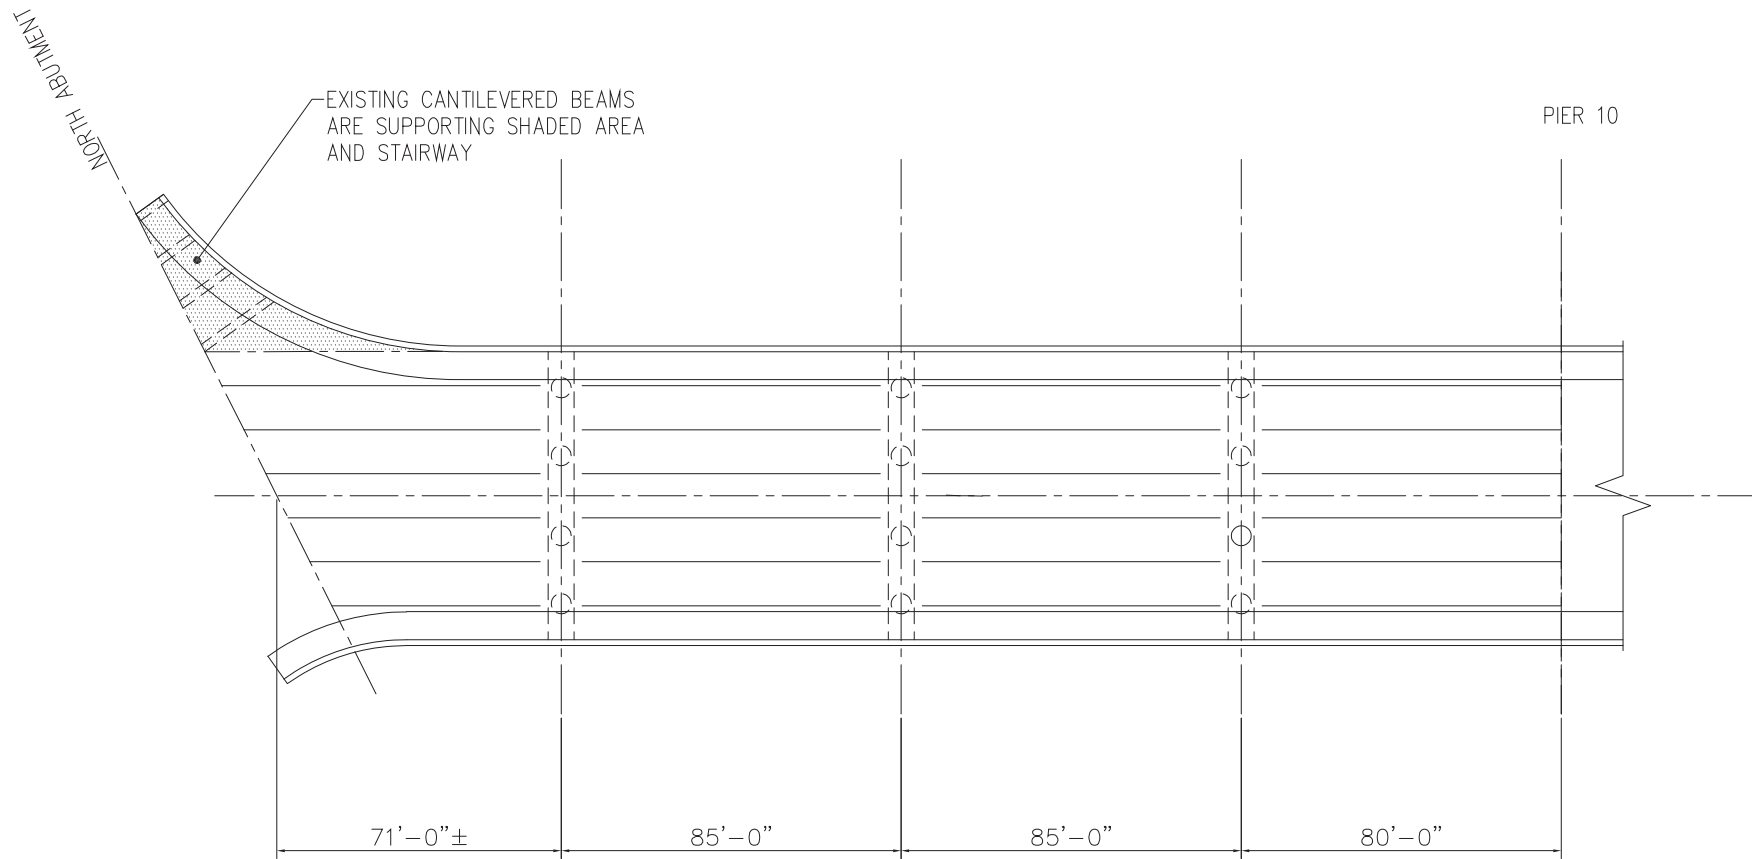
FOUR SPAN STEEL I-GIRDER DECK PLAN
